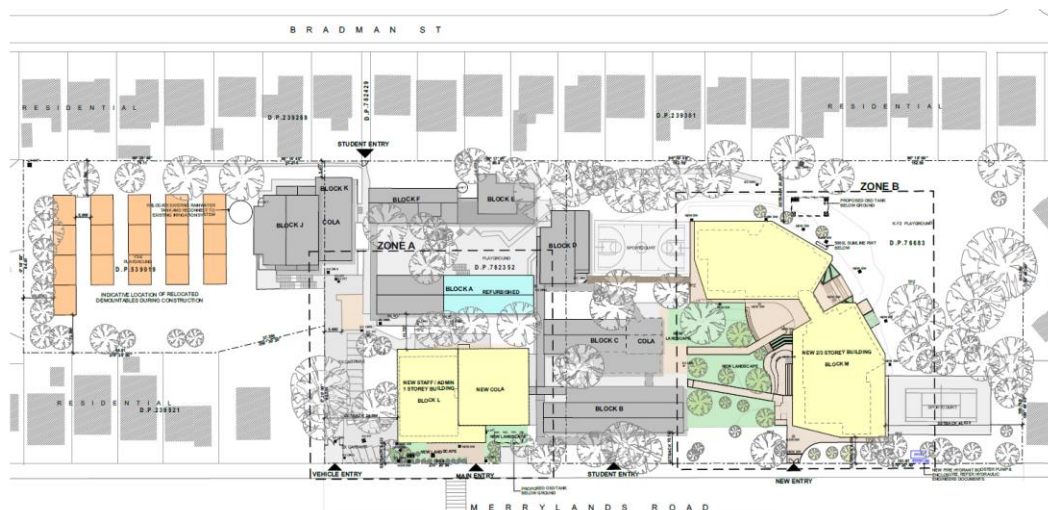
Extract of Site Plan for the proposed development (prepared by JDH Architects)
